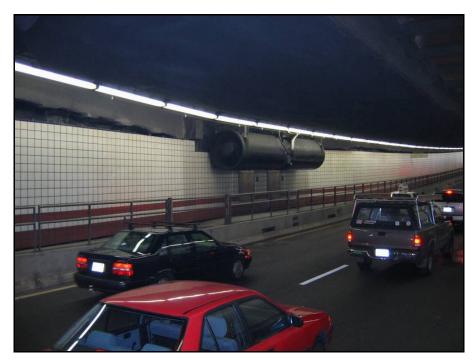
JET FAN AT LONGITUDINALLY VENTILATION RAMP
